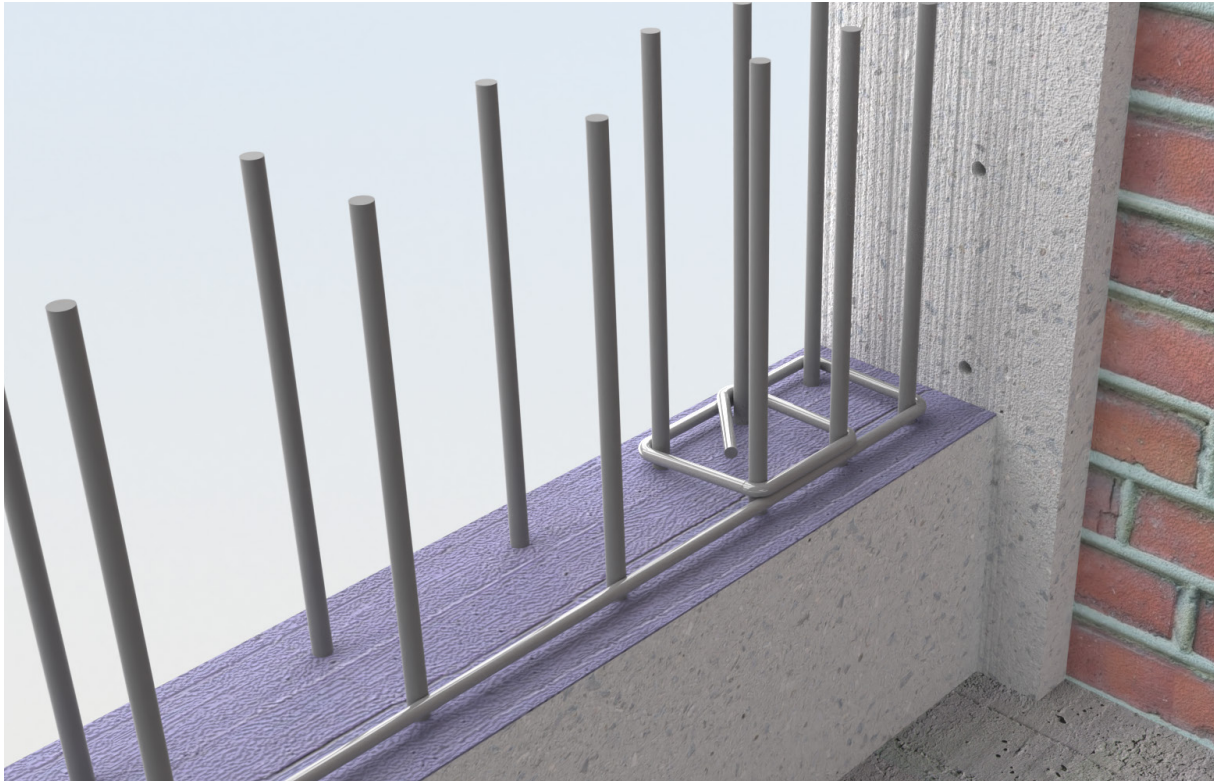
Step 4: Consequently, the first longitudinal rebars (with a length of 800 mm) can be placed inside these pre-drilled holes. Along these longitudinal rebars, stirrups and cross-ties should be placed to provide the steel framework before pouring the cast-in-place concrete.
